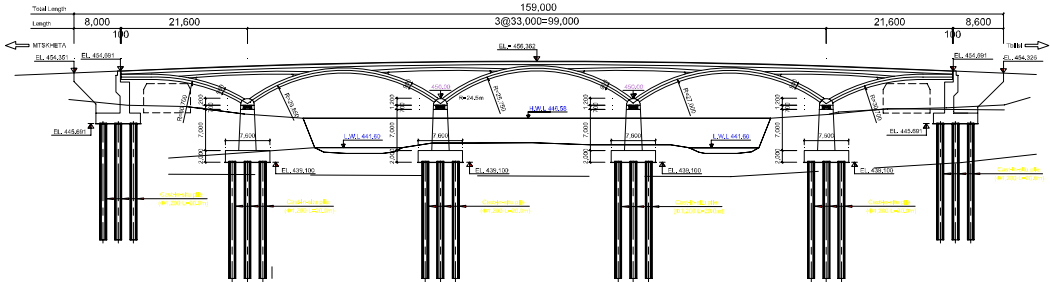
Aesthetic view of the designed Mtskheta bridge on r. Aragvi
